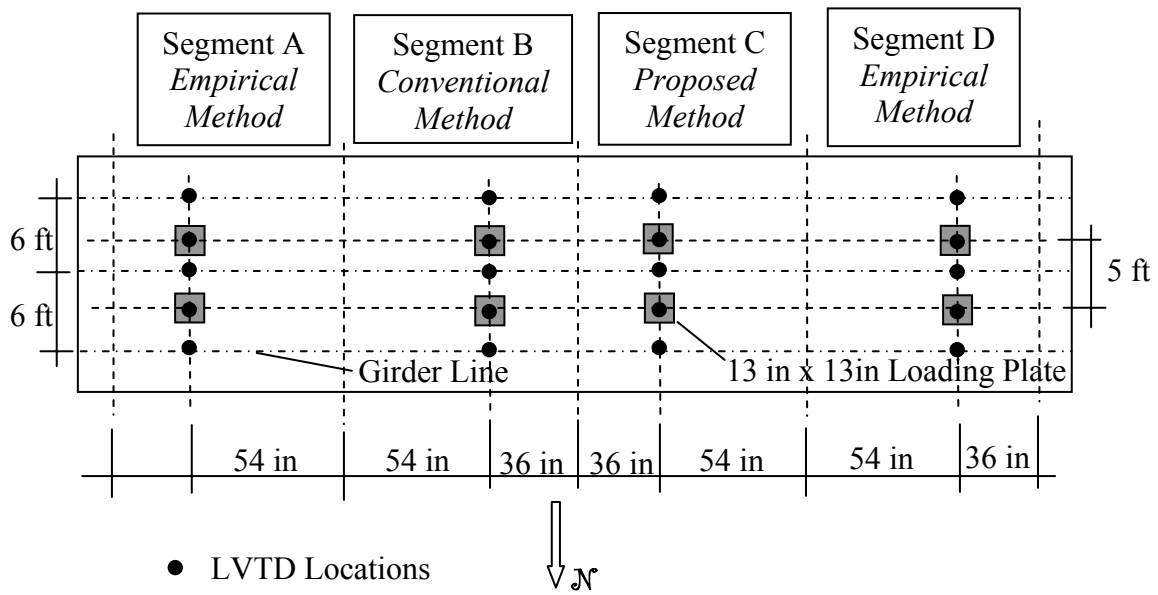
Loading and LVDT Positions for Static Load Tests
